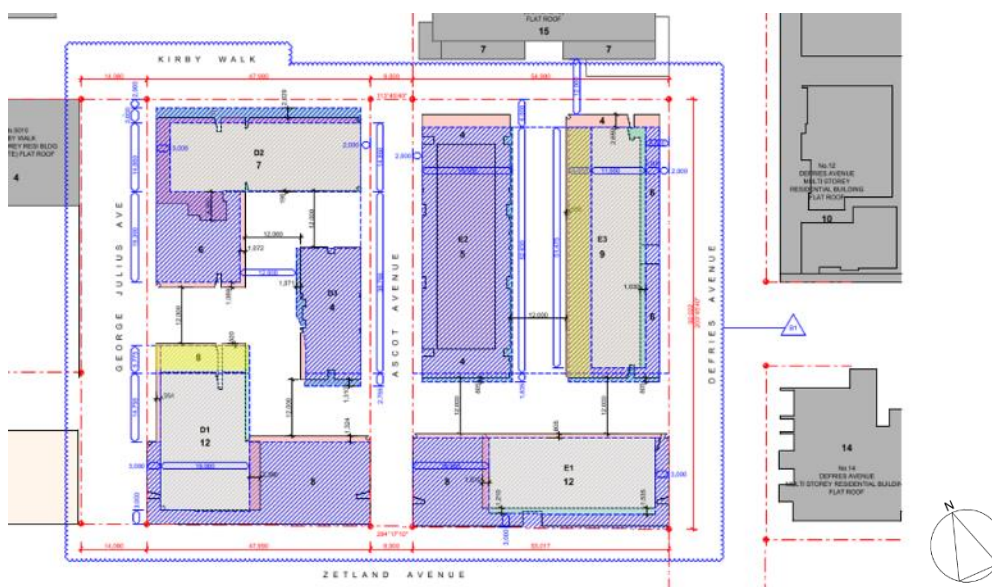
Site plan of Building groups D and E with areas of non-compliance highlighted in yellow
